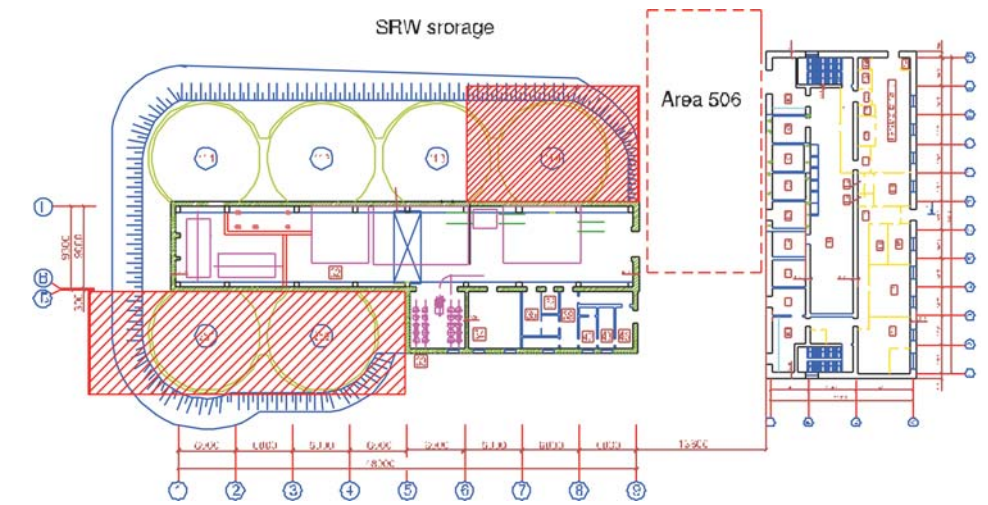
Layout of Buildings and Shelters for LRW Treatment Equipment for the Alternative Option
